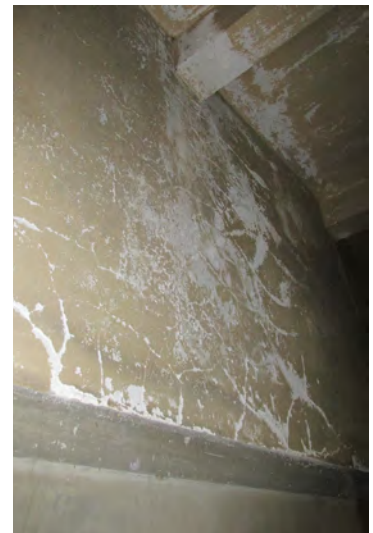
Cracks in plaster. (HA, 2015)
